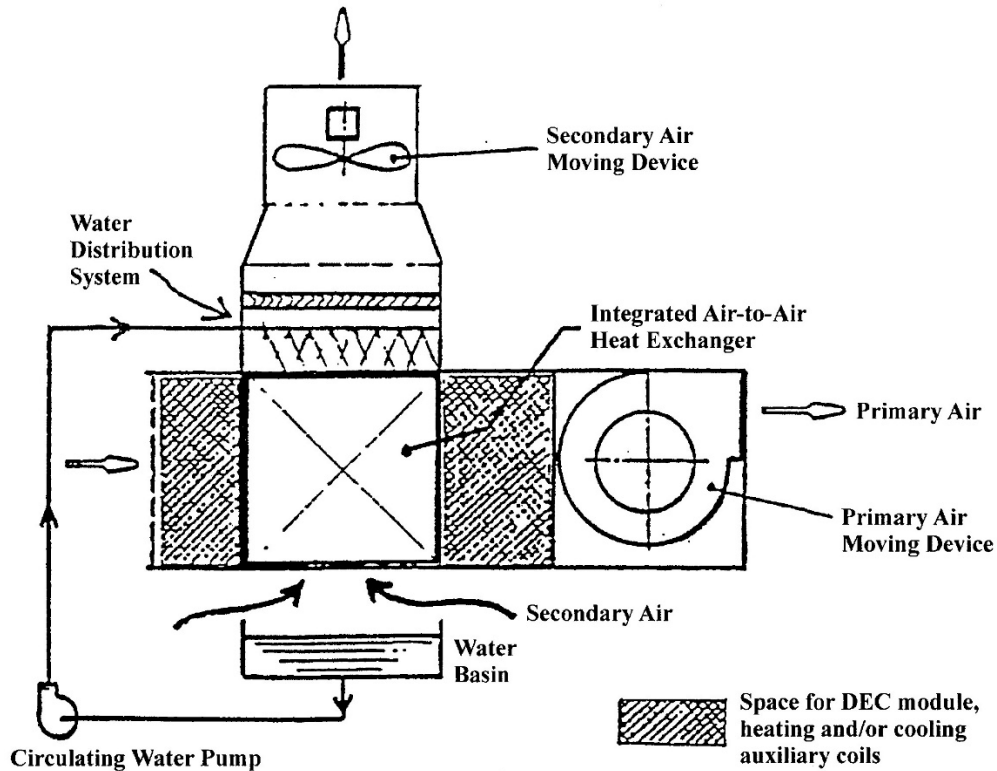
Packaged indirect evaporative cooler (packaged IEC).
